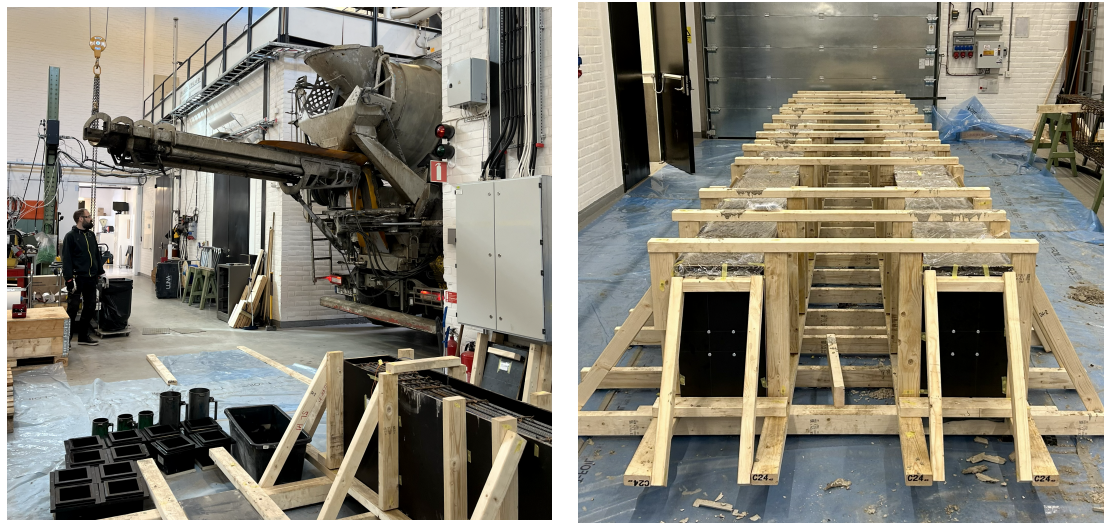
a) Casting the forms for beam, cubes and cylinders. b) Concrete hardening in the laboratory.
